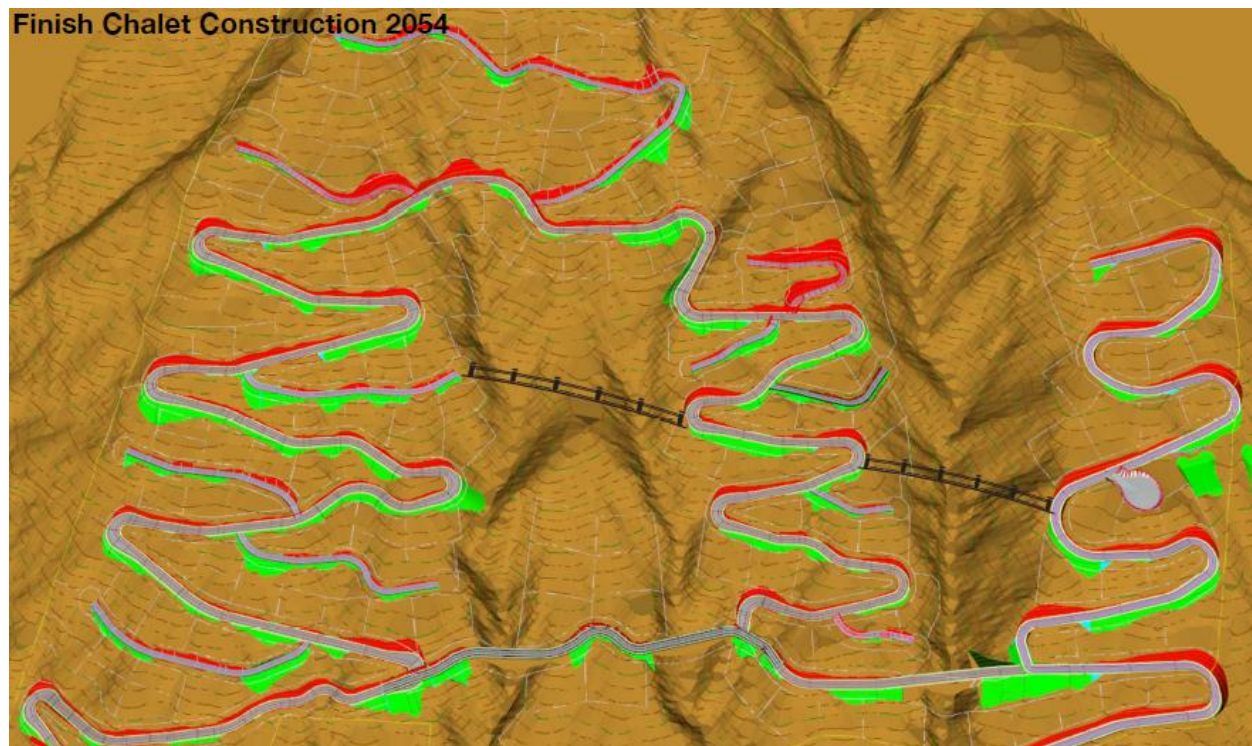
Fernhill Heights proposed roading layout with indicative footbridges to connect to gondola station
